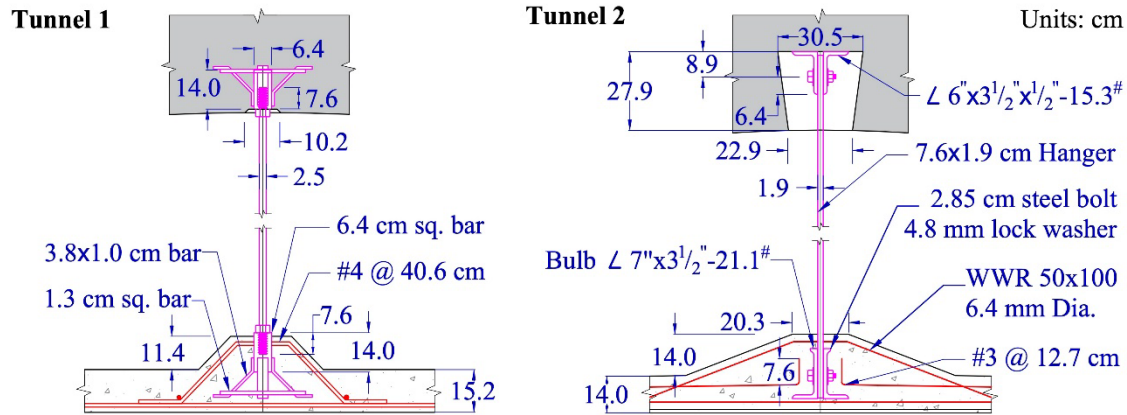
Details of the hanger between the tunnel liner and ceiling panels
